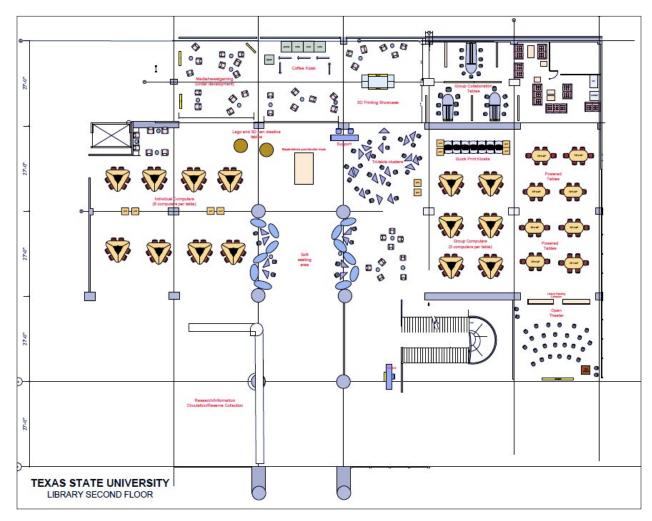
Floor plan for second floor. Image ourtesy of Albert B. Alkek Library, Texas State University
